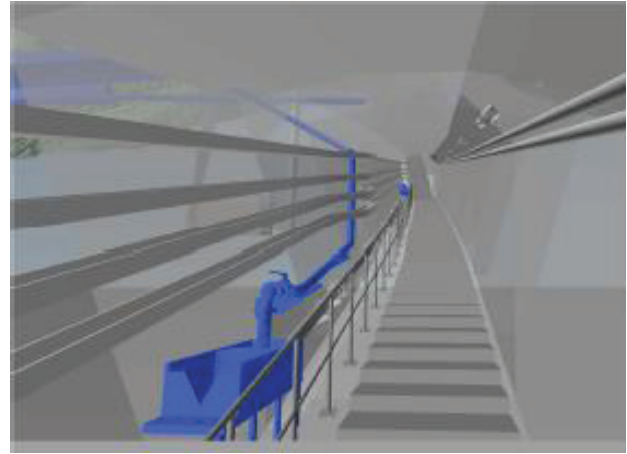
Conduits and cable racks on the side of the spillway in the inspection gallery
